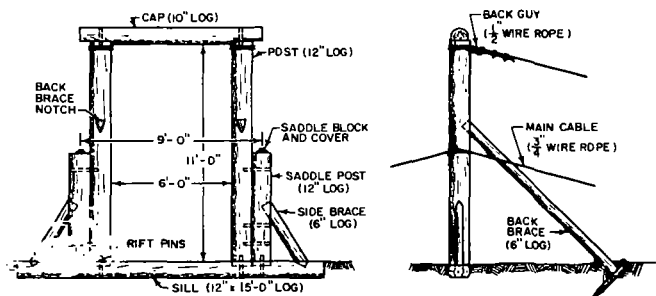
Modified tower for short (140 foot or less) suspension footbridges.
